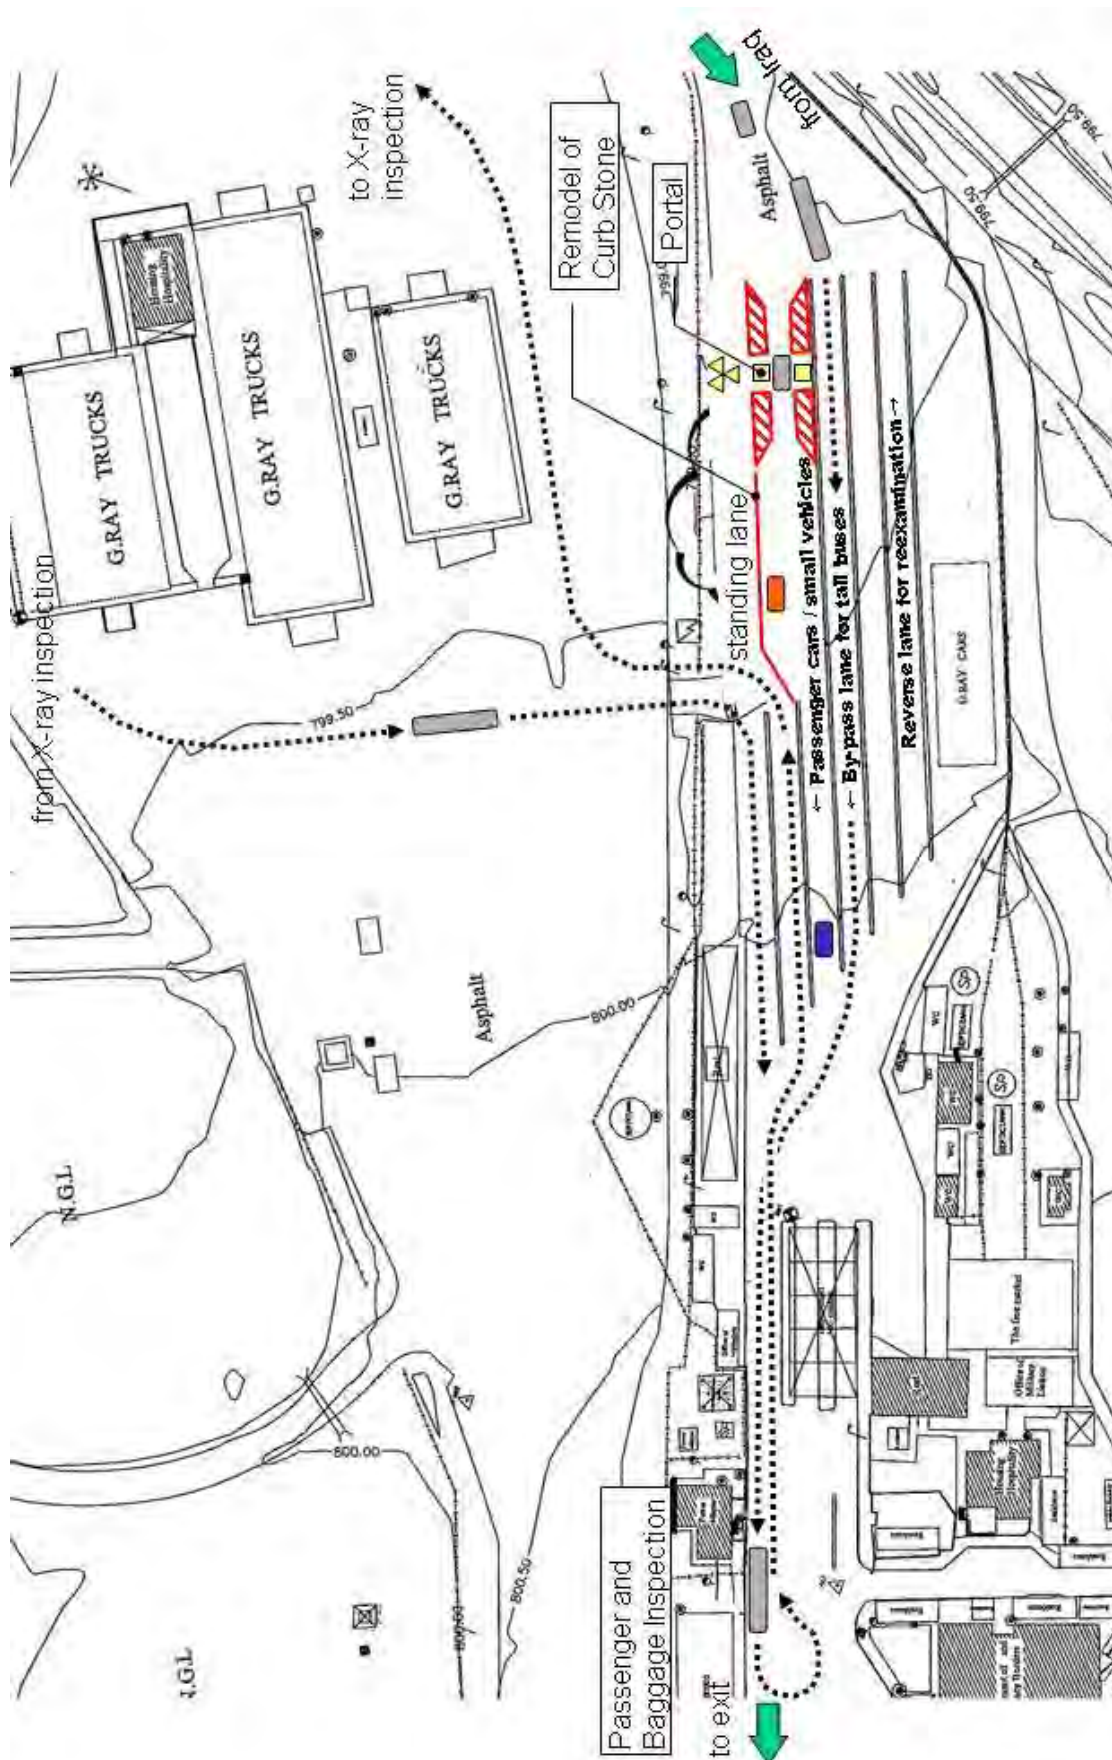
Facility Layout for X-ray Inspection Machine for Passenger Cars and Other Small Vehicles
